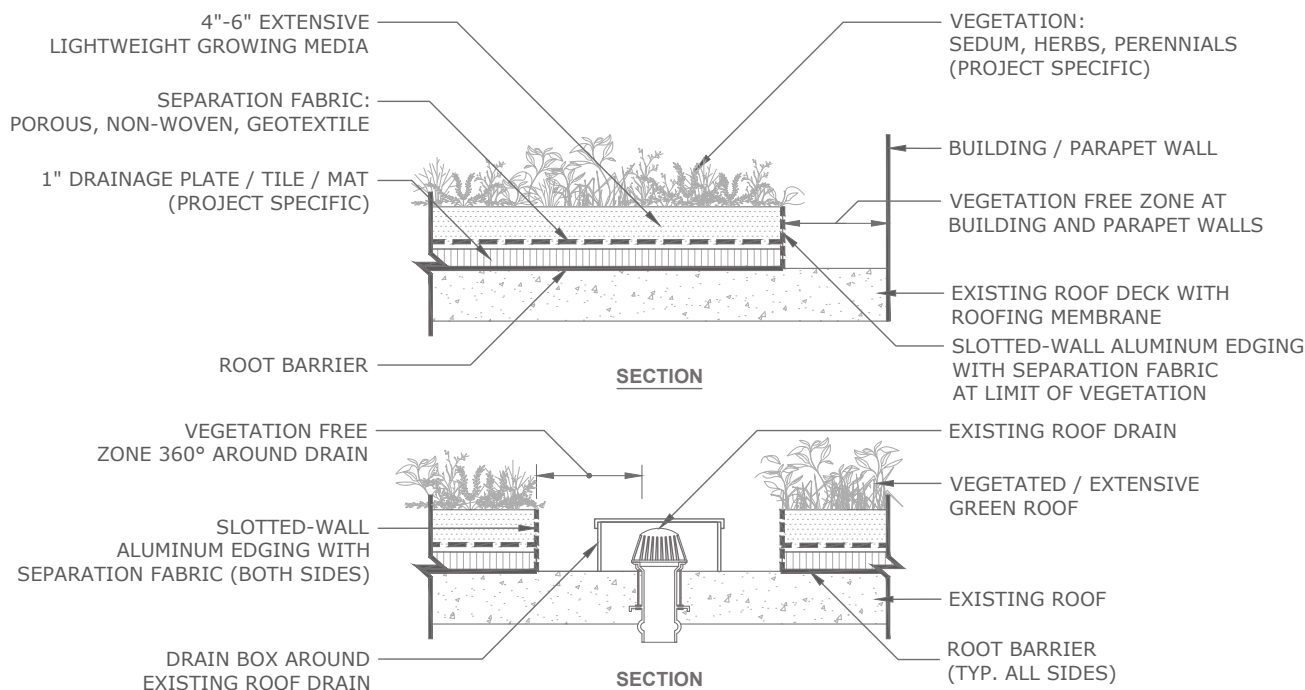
TYPICAL EXTENSIVE GREEN ROOF DETAIL
